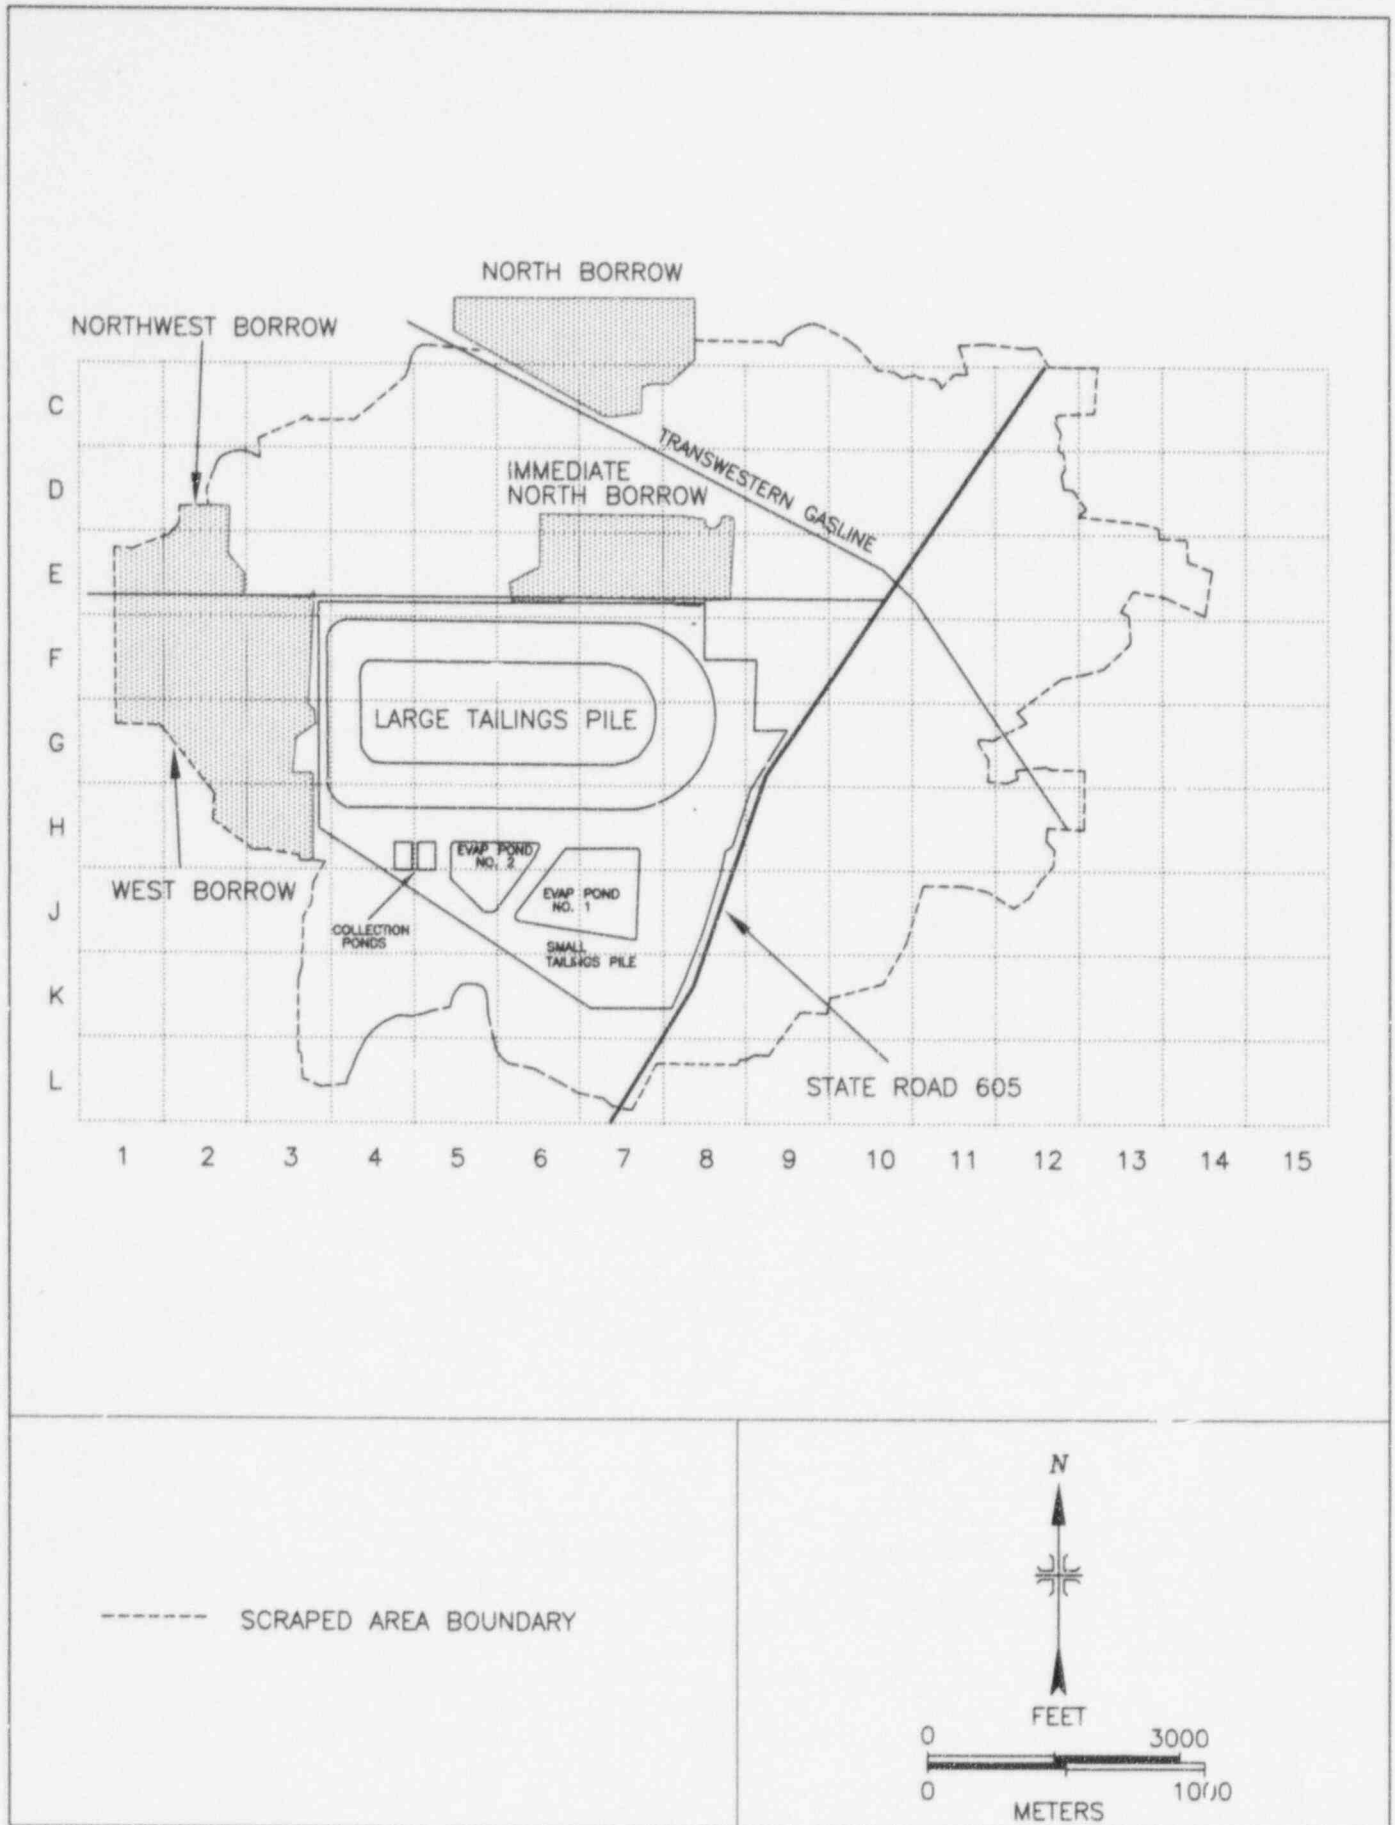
Plot Plan of Homestake Uranium Mill Site
